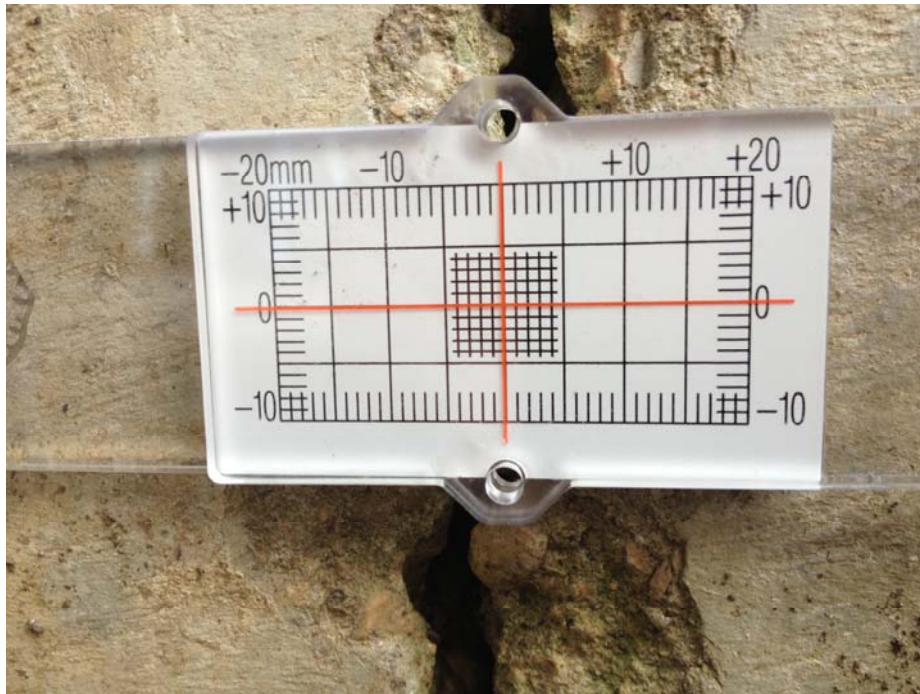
Crack Meter Located on the Retaining Wall Behind 306 Sask. Cres. E. (CM1) (Aug 12, 2013)
